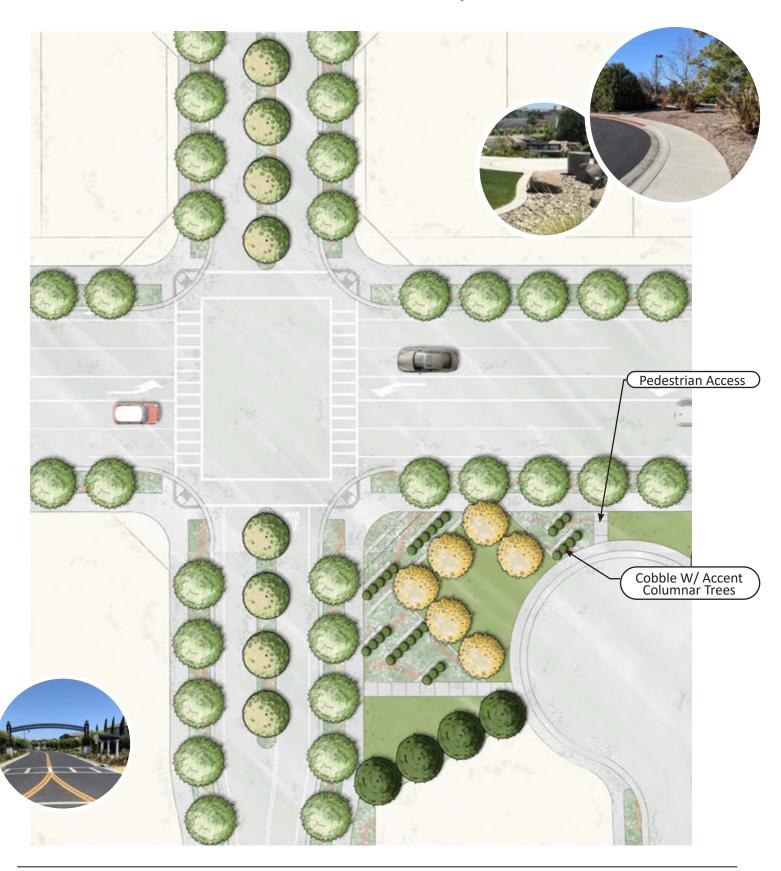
B STREET AND RIVER ISLANDS PARKWAY COMMUNITY GATEWAY CONCEPT PLAN
